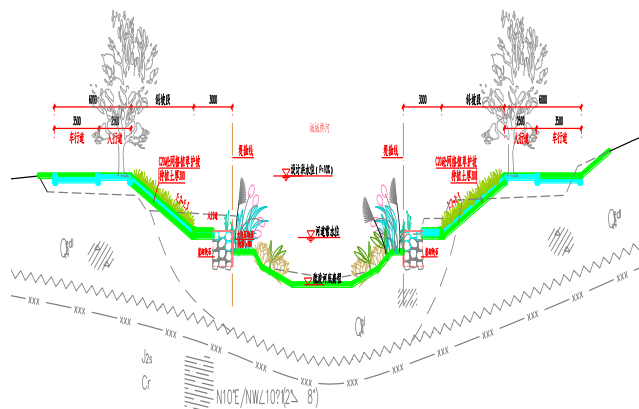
Proposed Cross Section of Banqiao River (Dianjiang)
